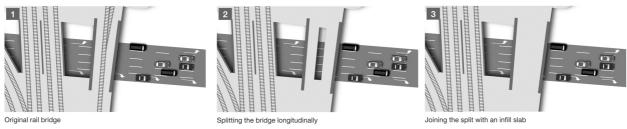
Three diagrams outlining the widening of the Countess Street Bridge
